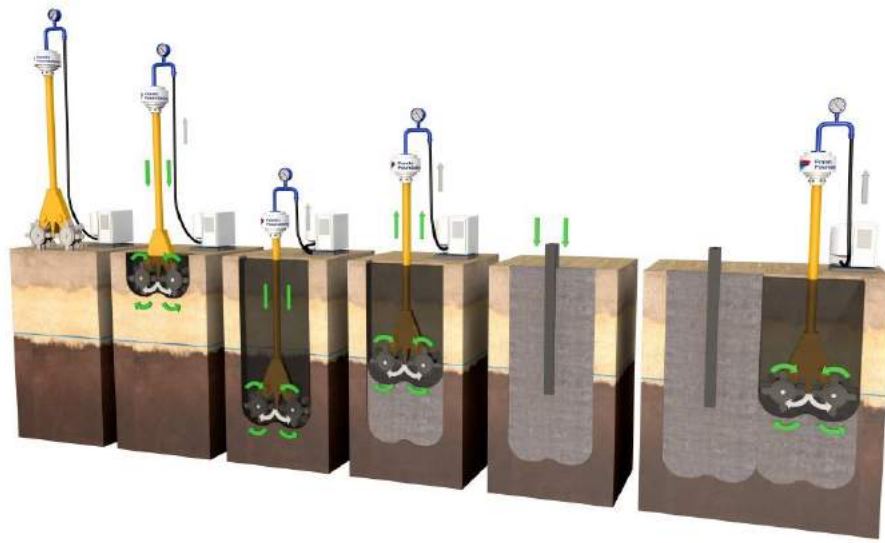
Production process of soil-mix panel walls (FrankiFoundations, 2016)
